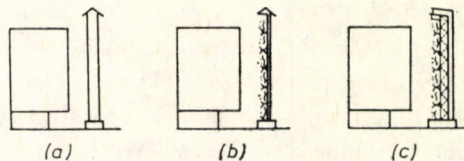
Various noise screening walls: (a) simple solid wall, (b) sound absorbing wall made from absorbent blocks, (c) solid wall with absorbent block lining
